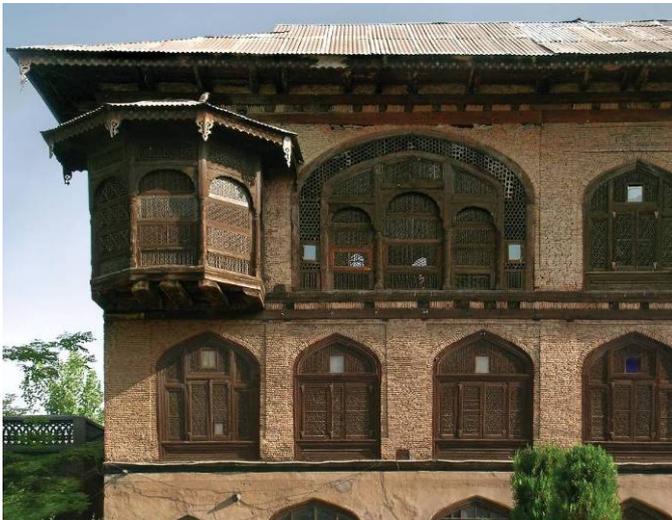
Detail of the Jalali Haveli, Srinagar, Kashmir, India, ca. 1860. This is a timber-laced bearing wall masonry structure known as *taq* construction in India and *bhatar* construction in Pakistan. The timber lacing at the floor levels is visible on the exterior as part of the architectural expression.
